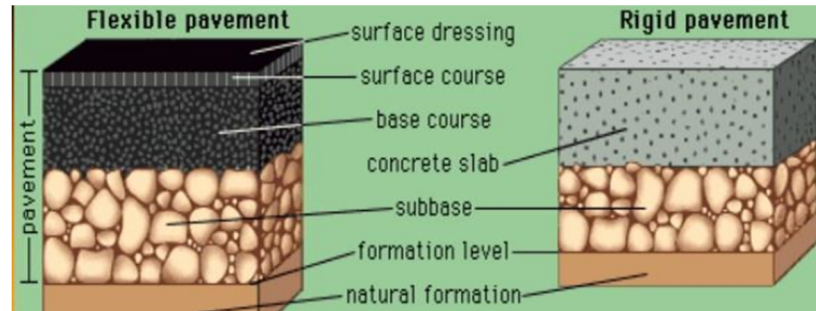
Road building technologies: a flexible pavement and a rigid pavement according with [35]
